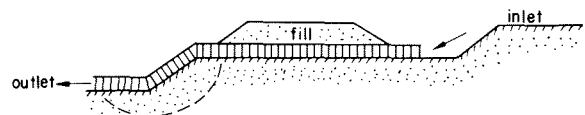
Culvert outlet extended using a pipe spillway beyond the toe of slope to prevent erosion and washing away of the fill.
